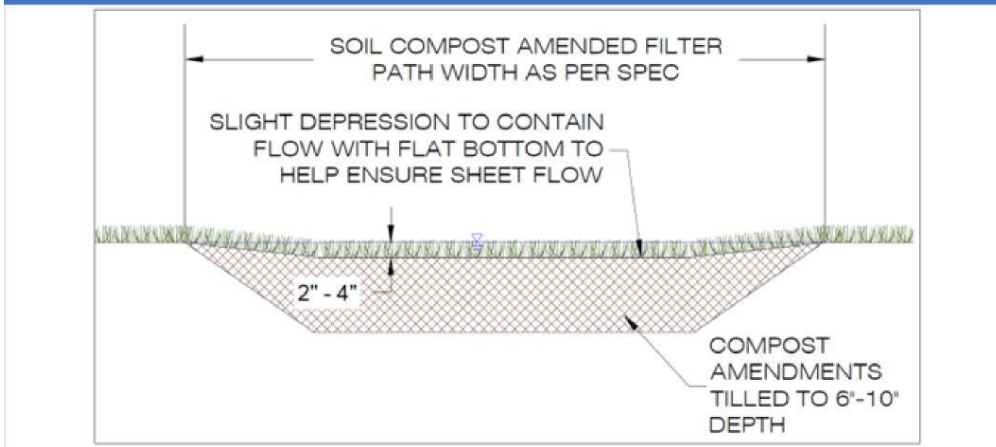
Disconnection: Alternate Practice: Compost Amended Filter Path to Downstream Bioretention Section View
